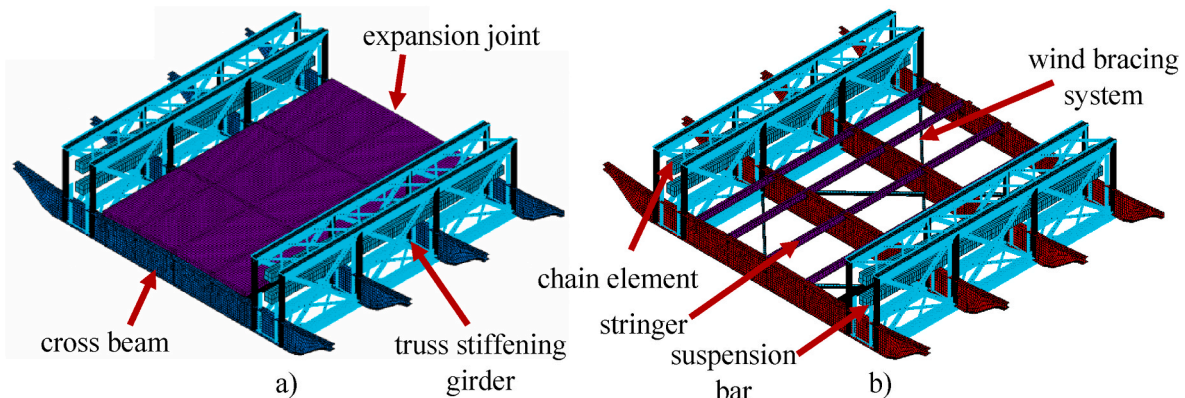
Isometric view of the finite element model a) with and b) without reinforced concrete slab.
